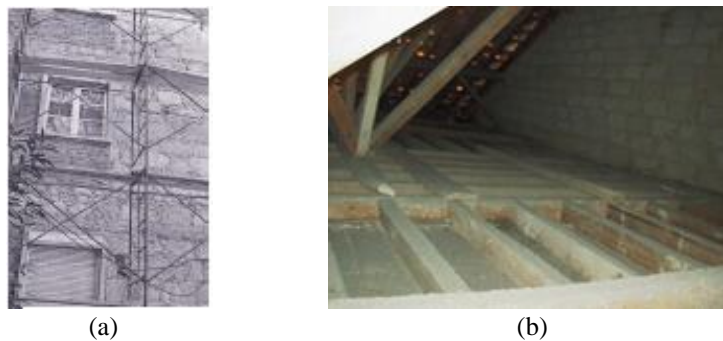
Examples of different walls used: a) façade wall with rubble masonry (Alegre, 1999), b) gable wall with concrete blocks (Mauro and Bento, 2012)
